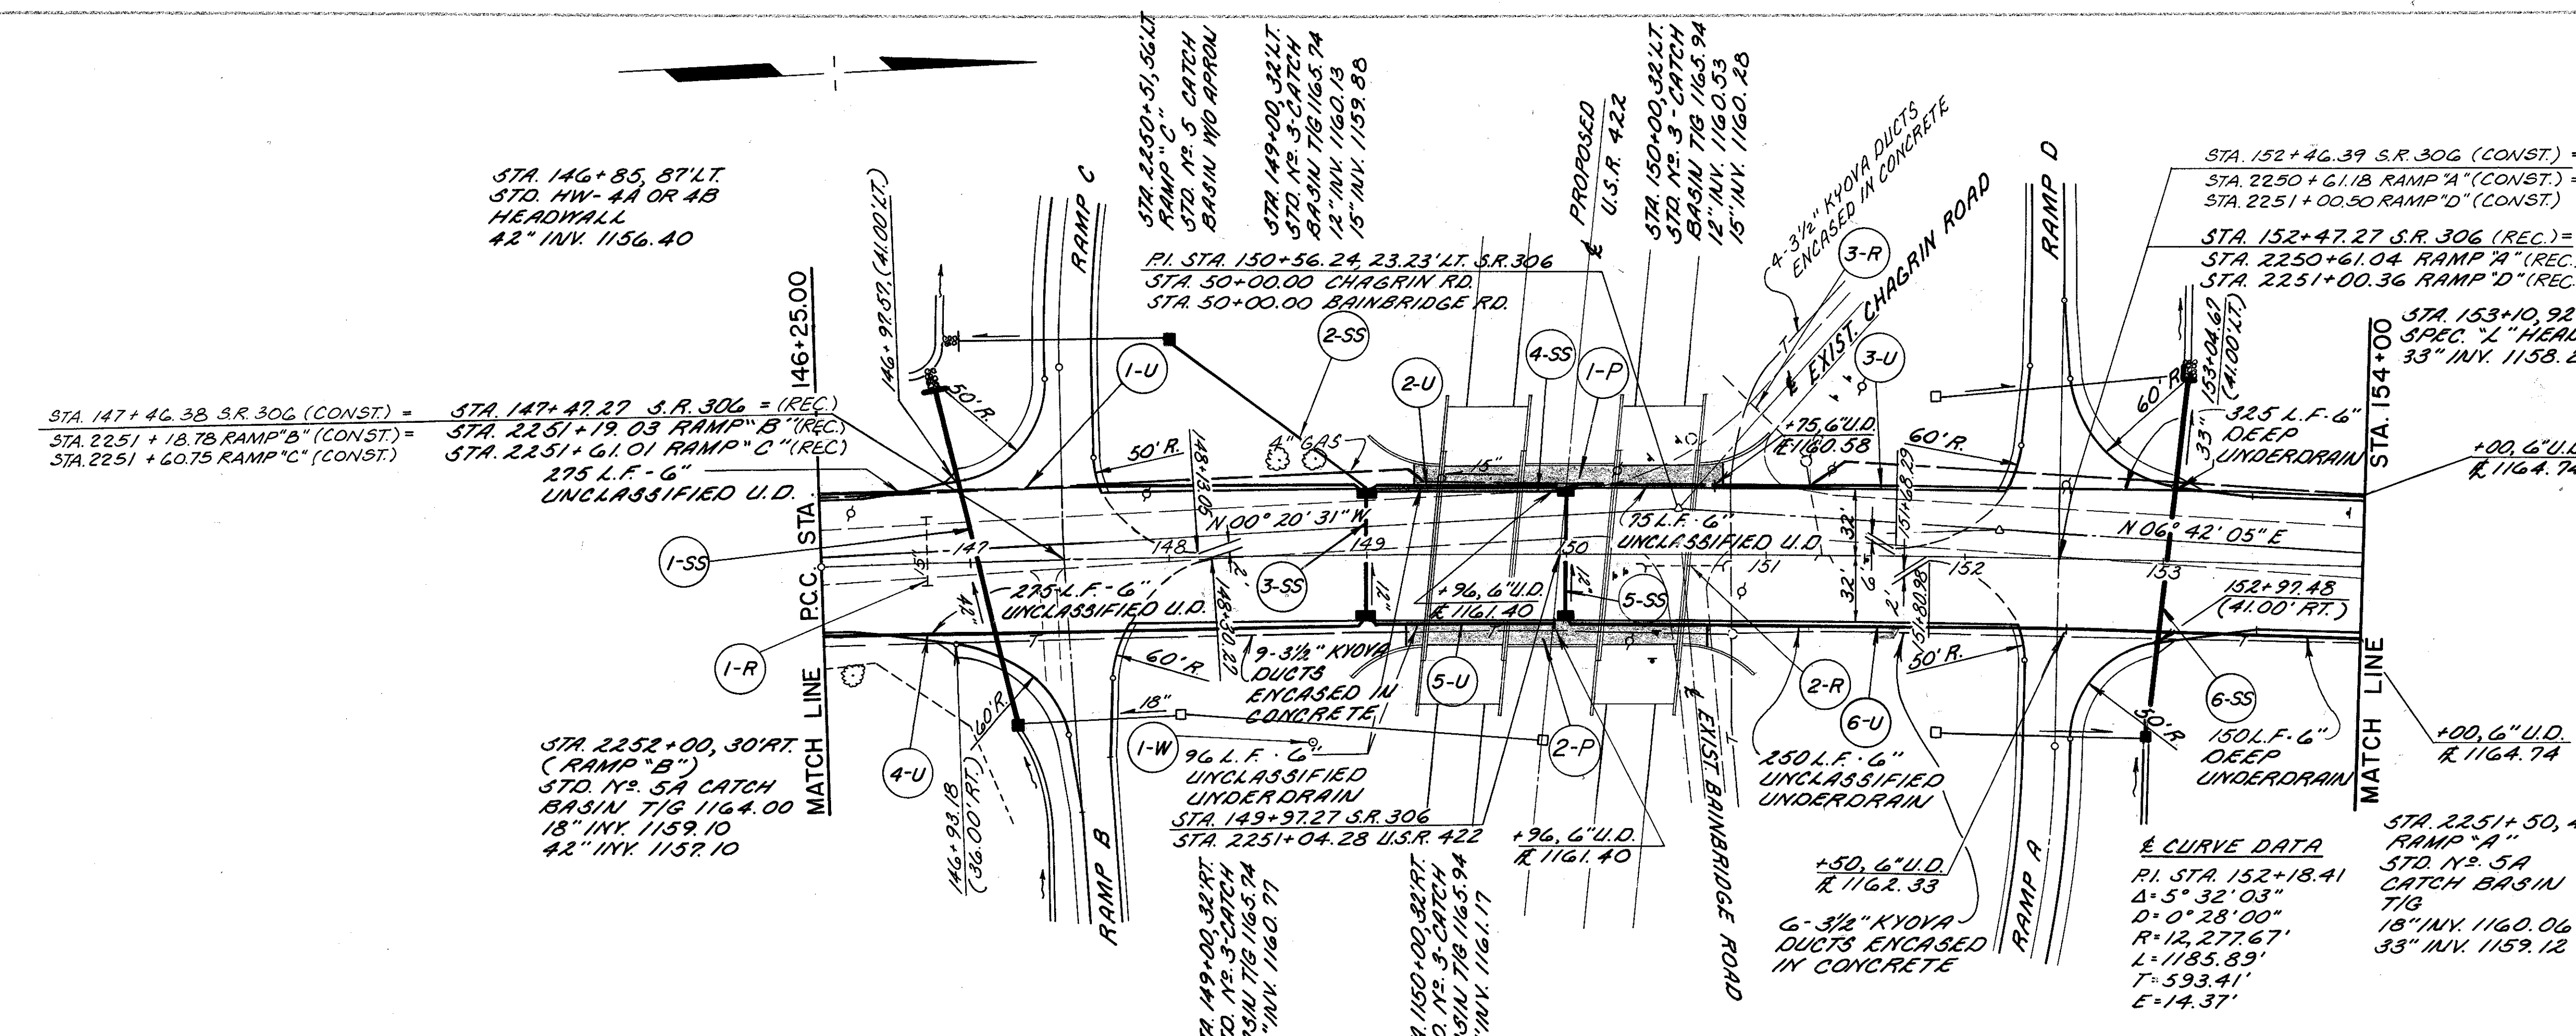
DETAIL BAINBRIDGE RD. WEST COMPOSITION
